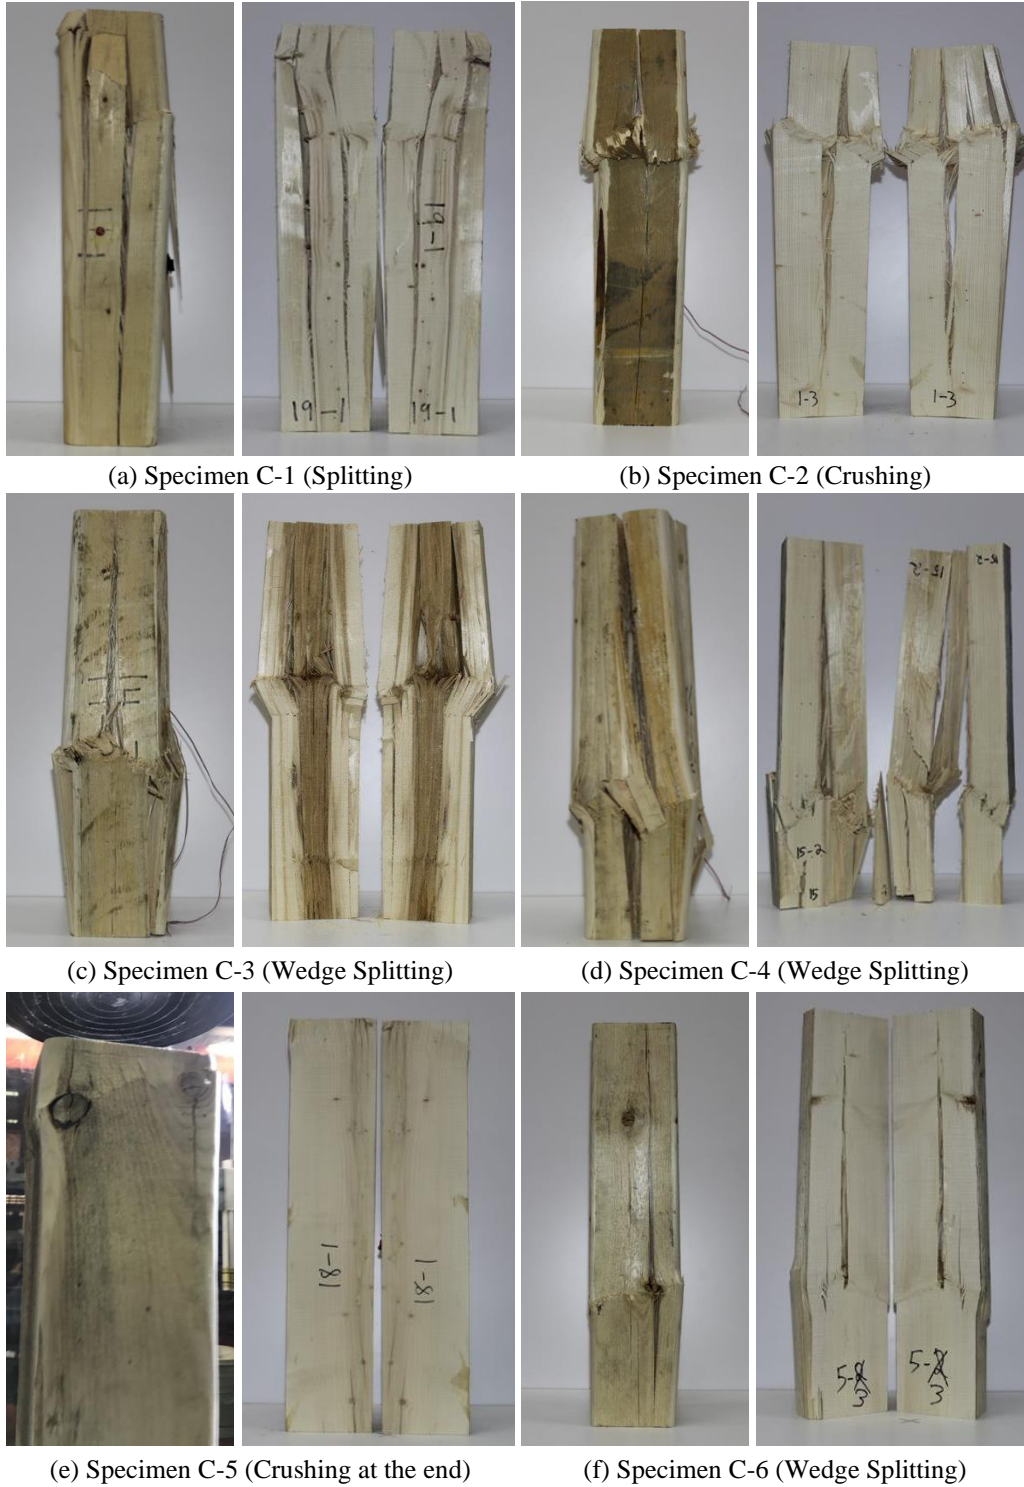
Post-Test Damage and Failure Modes of Control Specimens
